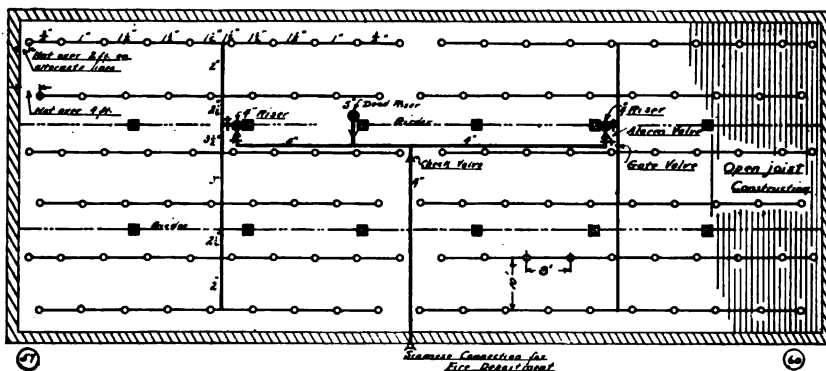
PLAN SHOWING FEED MAINS IN BASEMENT AND SPACING OF SPRINKLERS UNDER OPEN JOIST CEILING.
